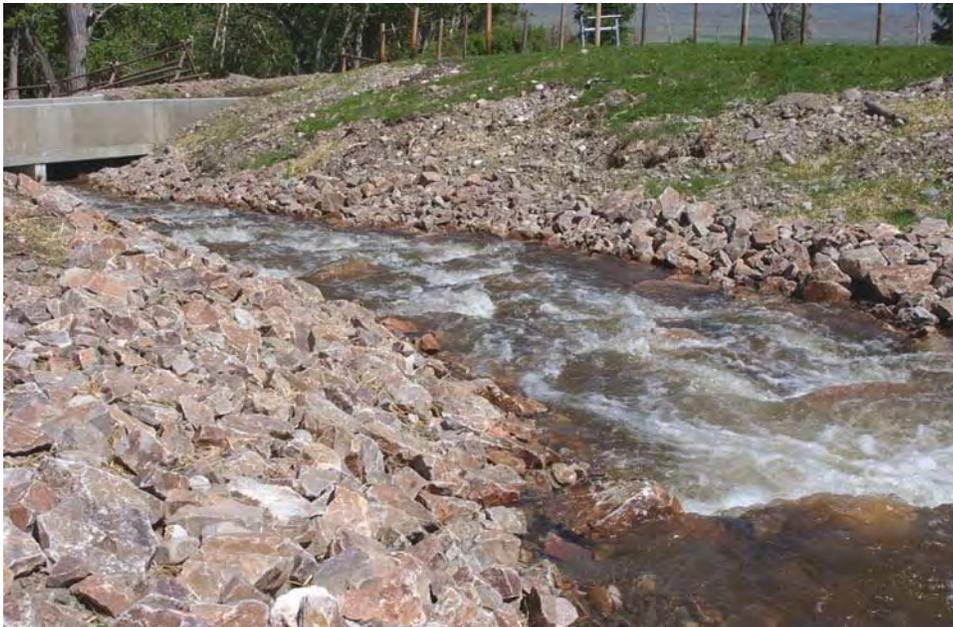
A 5:1 sloping floor, 18 feet long, was added to the downstream side of the spillway to yield a shallow depth of water that would prevent fish from jumping over the checkboards during normal canal operations.
